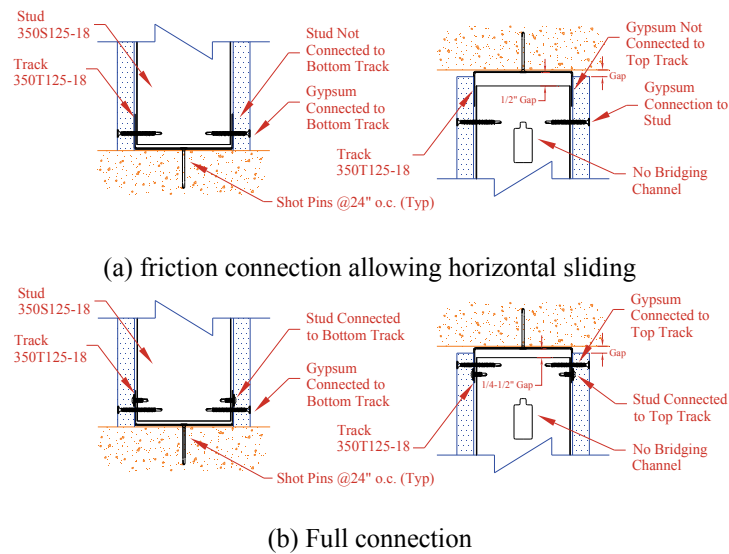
Typical framing and sheathing details (from Retamales et al. 2010)
